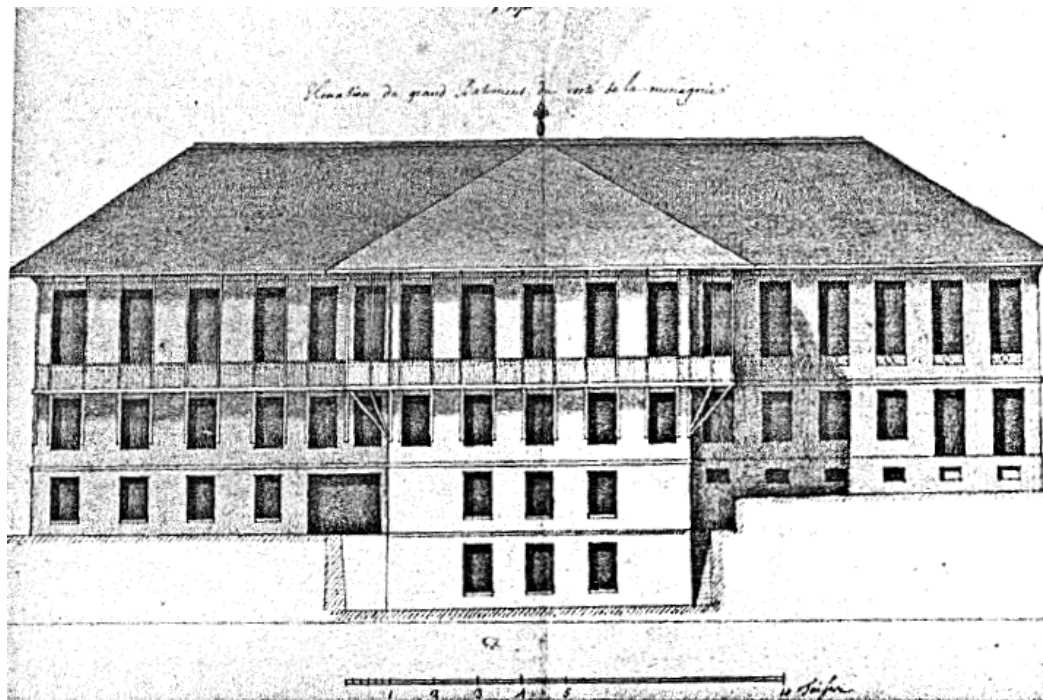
Pierre Vigné de Vigny, elevation of the proposed rebuilding of the Palais de France, 1722. CADN, 166PO/A/252, fol. 34.
